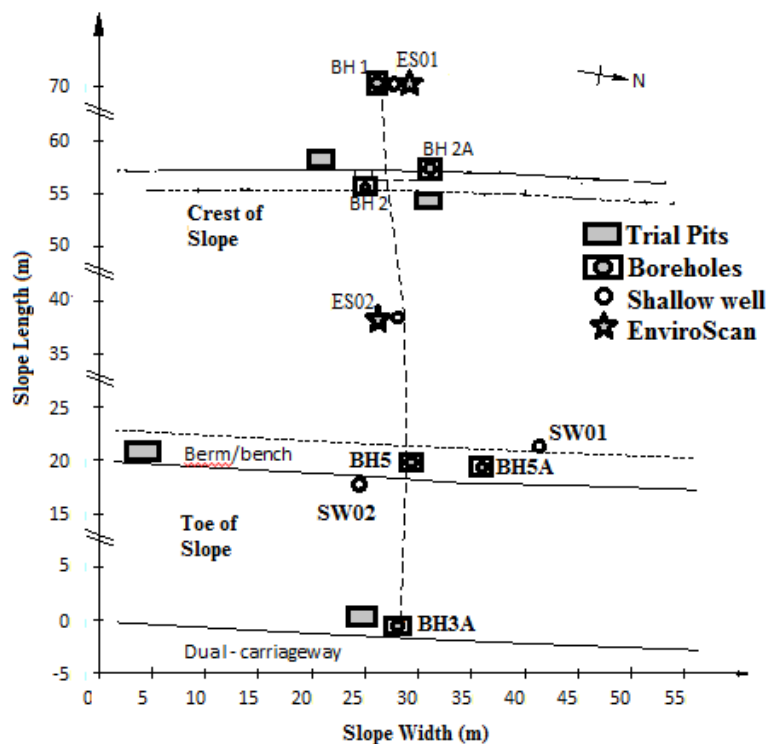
Monitoring equipment located along the slope of Loughbrickland excavation (McLernon, 2014).
